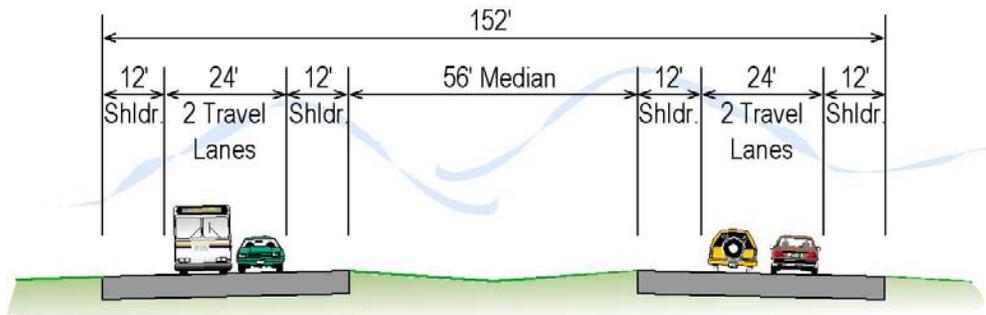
Package B Typical I-25 Cross Section - SH 14 to Harmony Rd.
